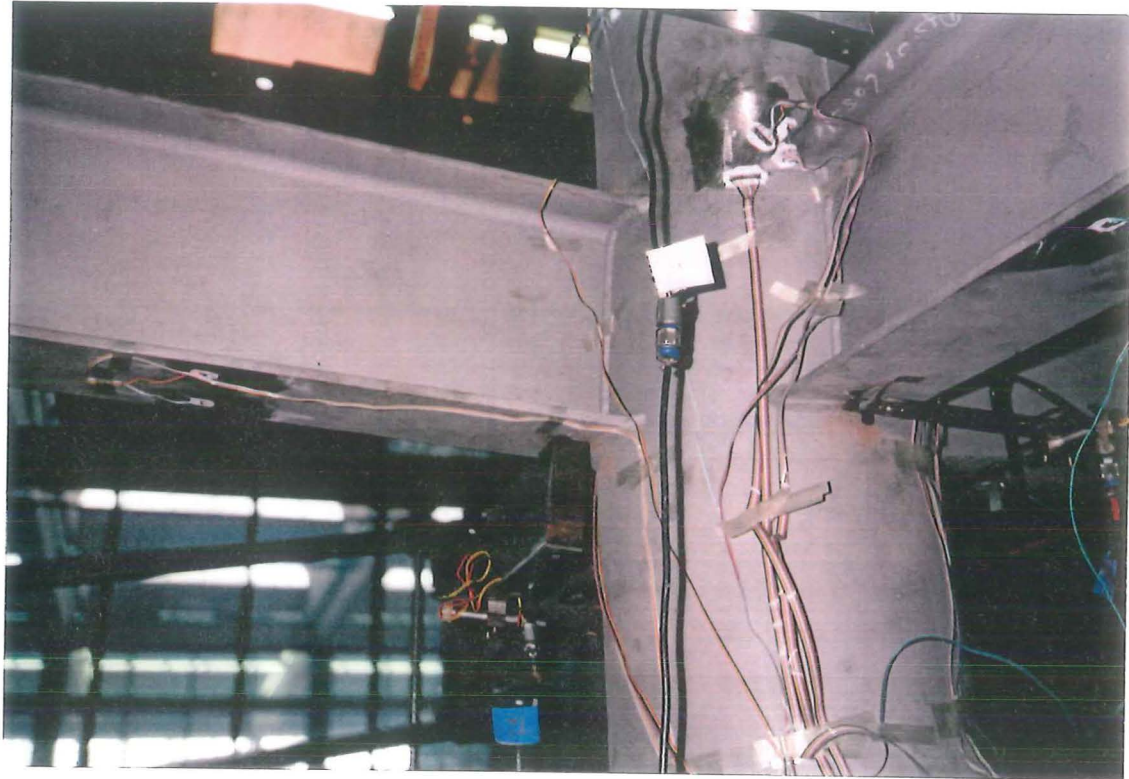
Instrumentation on 3C3 and 3R3 at failure
